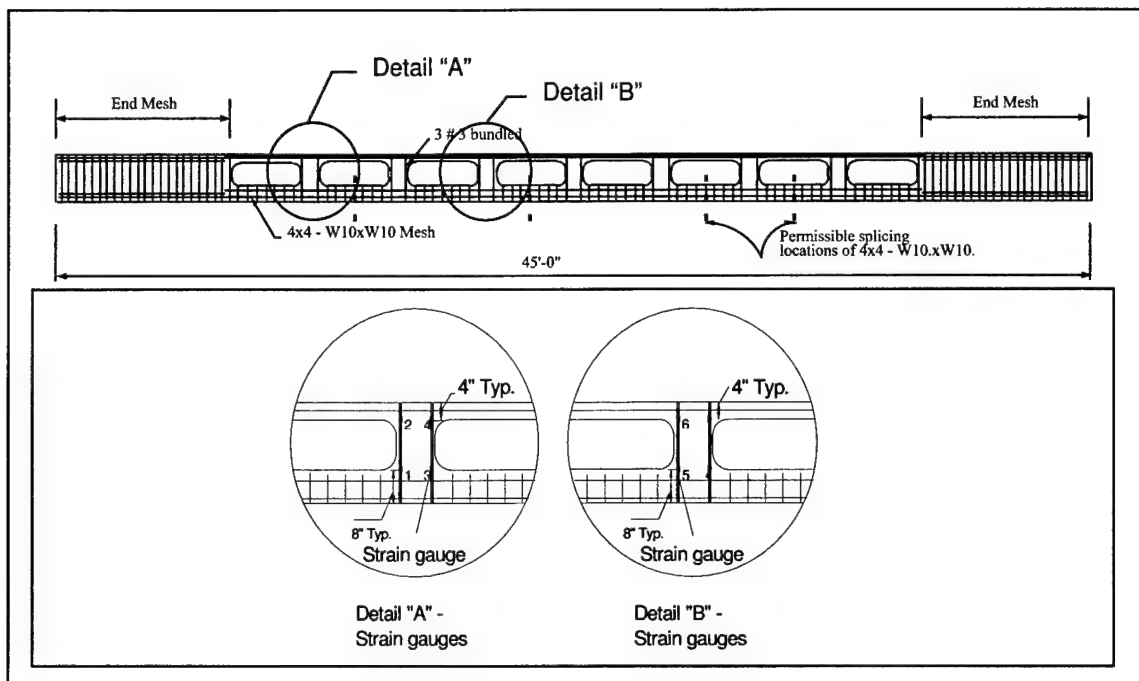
Instrumentation details for Series 2 Specimen D8R1.
